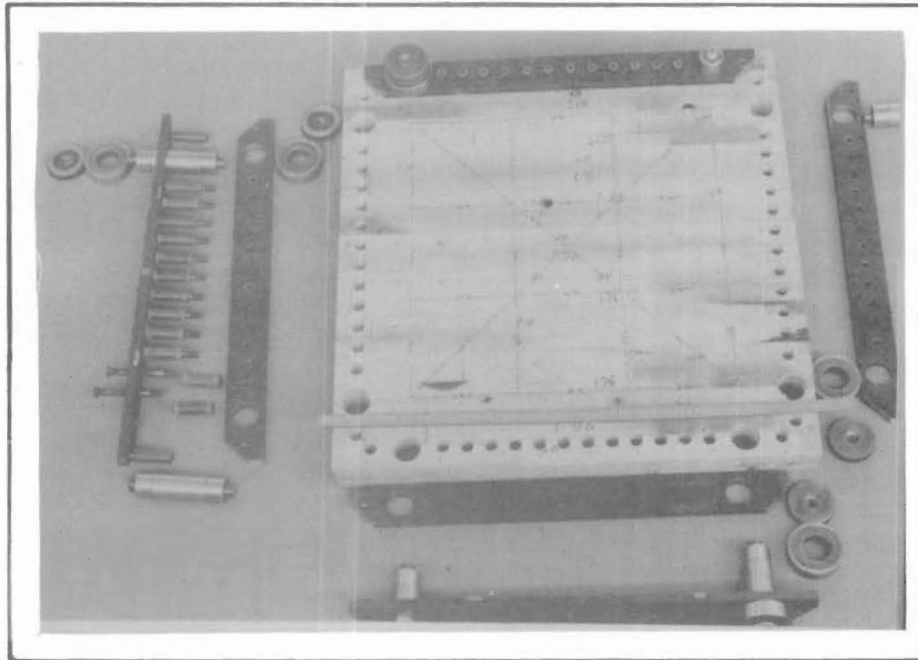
Showing assembly of shear apparatus on prototype element.
